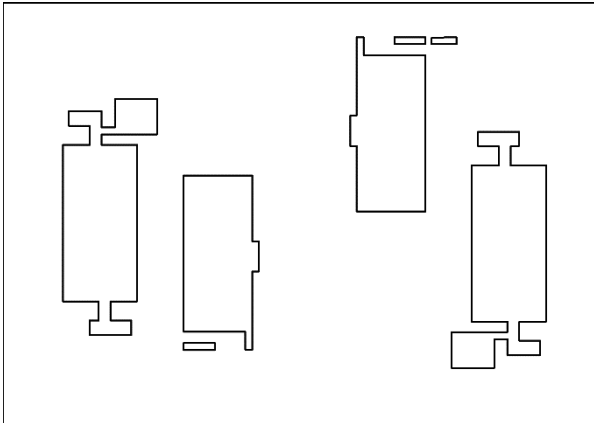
Example of a floor plan of a Brazilian Youth Prison - Form E
